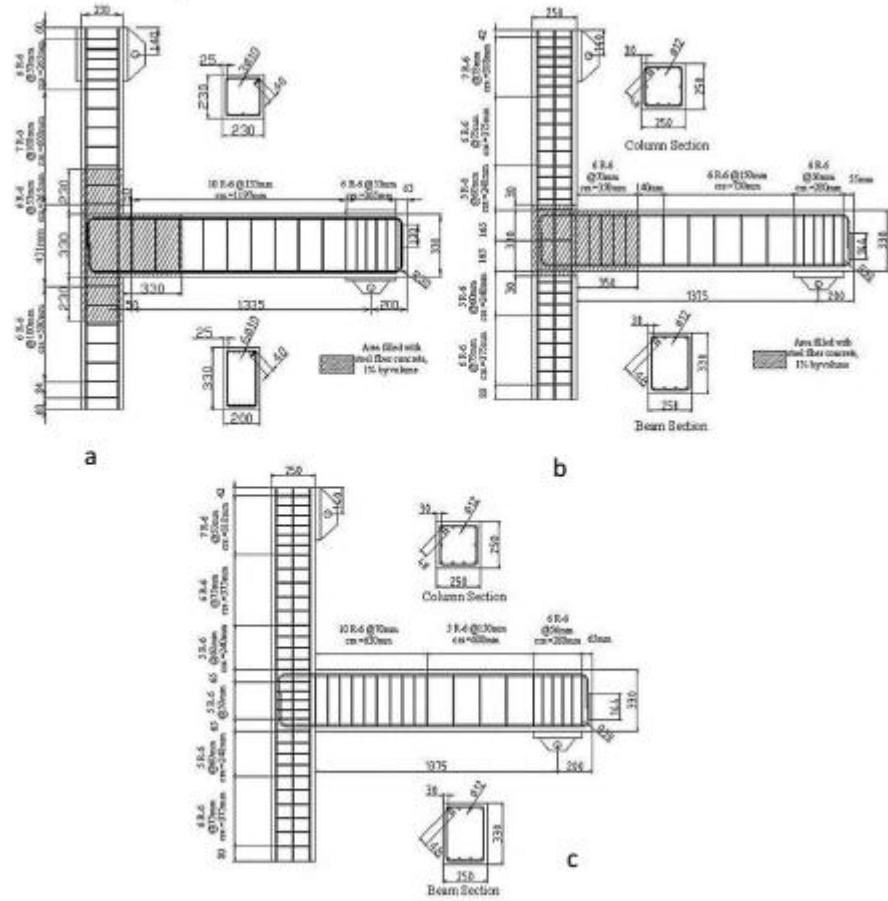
Details of the tested specimens, a) first group, b) second group and c) tired group [52].
